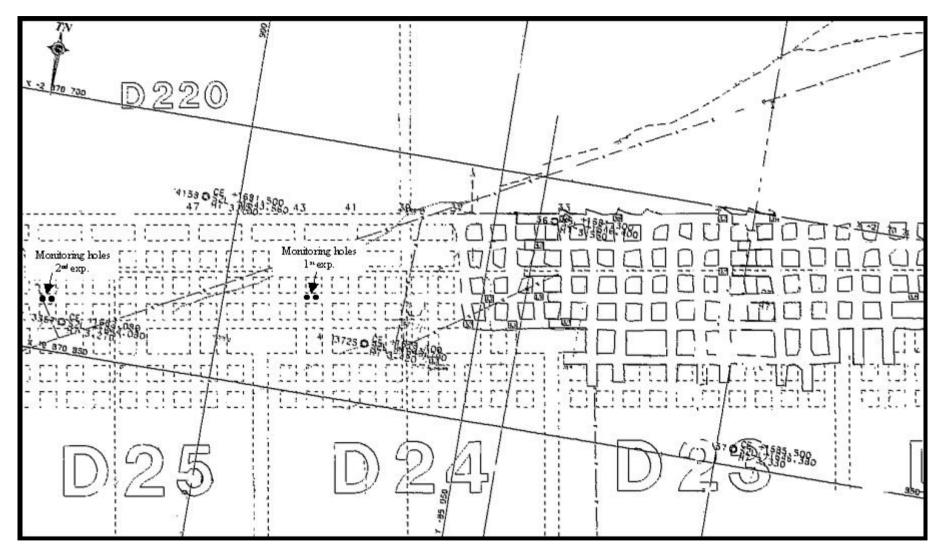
Section plan Colliery 'A' Site 1 (not scaled)
